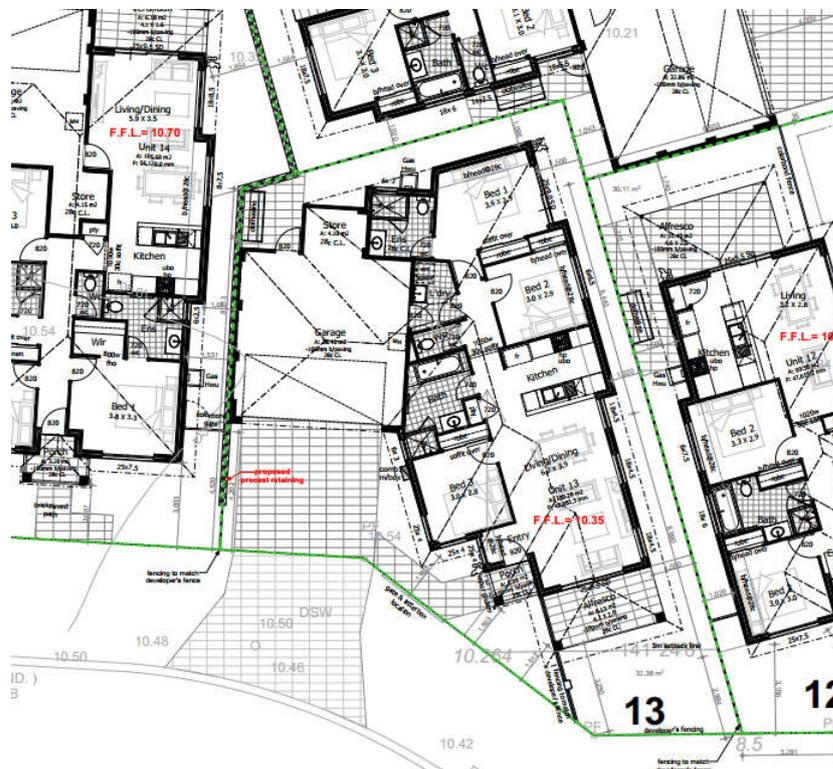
Floor plans of a proposed grouped dwelling development including a compromised layout to account for irregular strata lot angles and dimensions (source: author)
